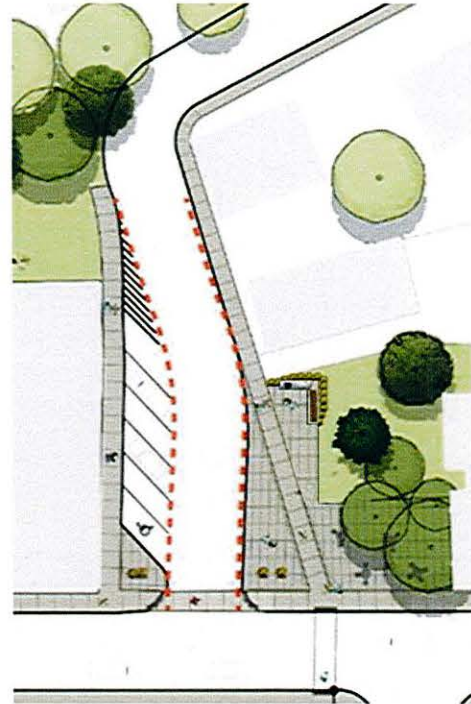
New road geometry with 45 degree parking stalls, concrete bump outs and plaza extension.
